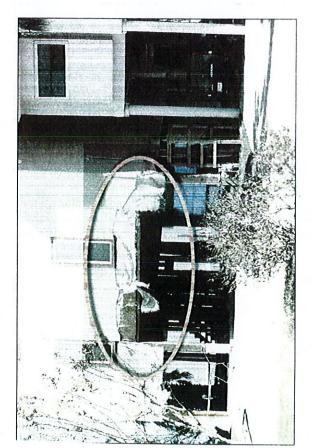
Building siding extended down and over the breakaway wall. Lack of a clean separation allowed damage to spread upward as the breakaway wall failed.
